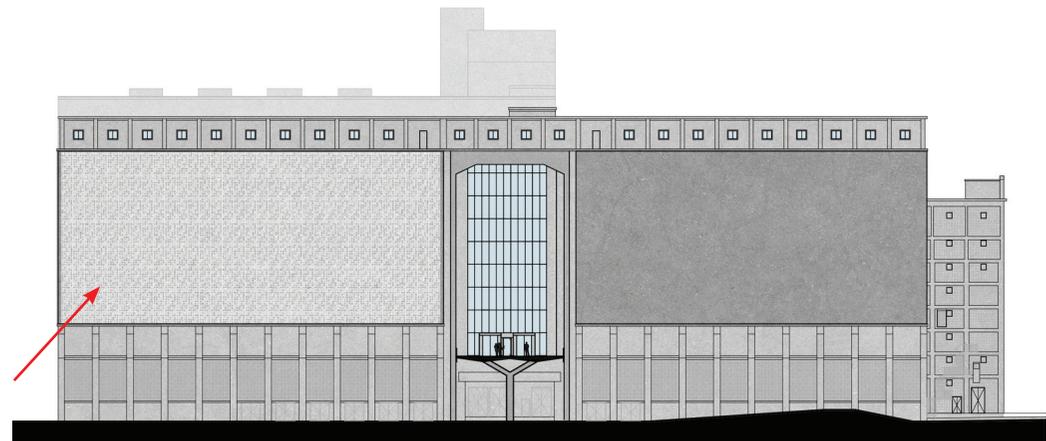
Elevation of north facade, with a second skin to partially cover the window openings in the original silo wall, resulting in a new look while preserving the monolithic character
